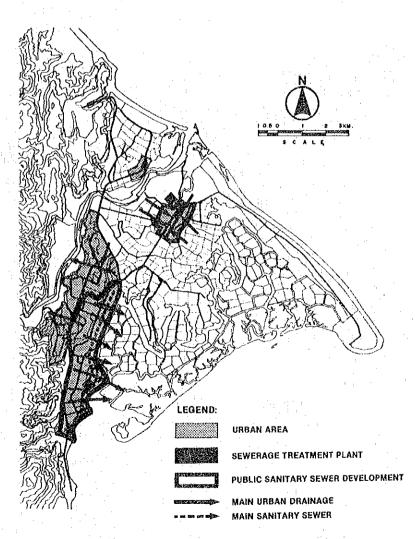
DRAINAGE & PUBLIC SANITARY SEWER SYSTEM DEV'T PLAN (2000)
